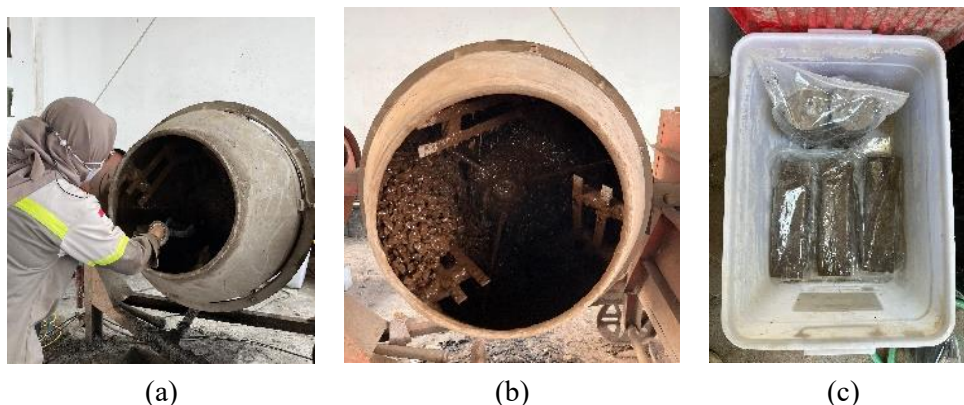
Mixing and Curing, (a) Mixing Procedure, (b) Concrete Mixer, (c) Ambient Curing
